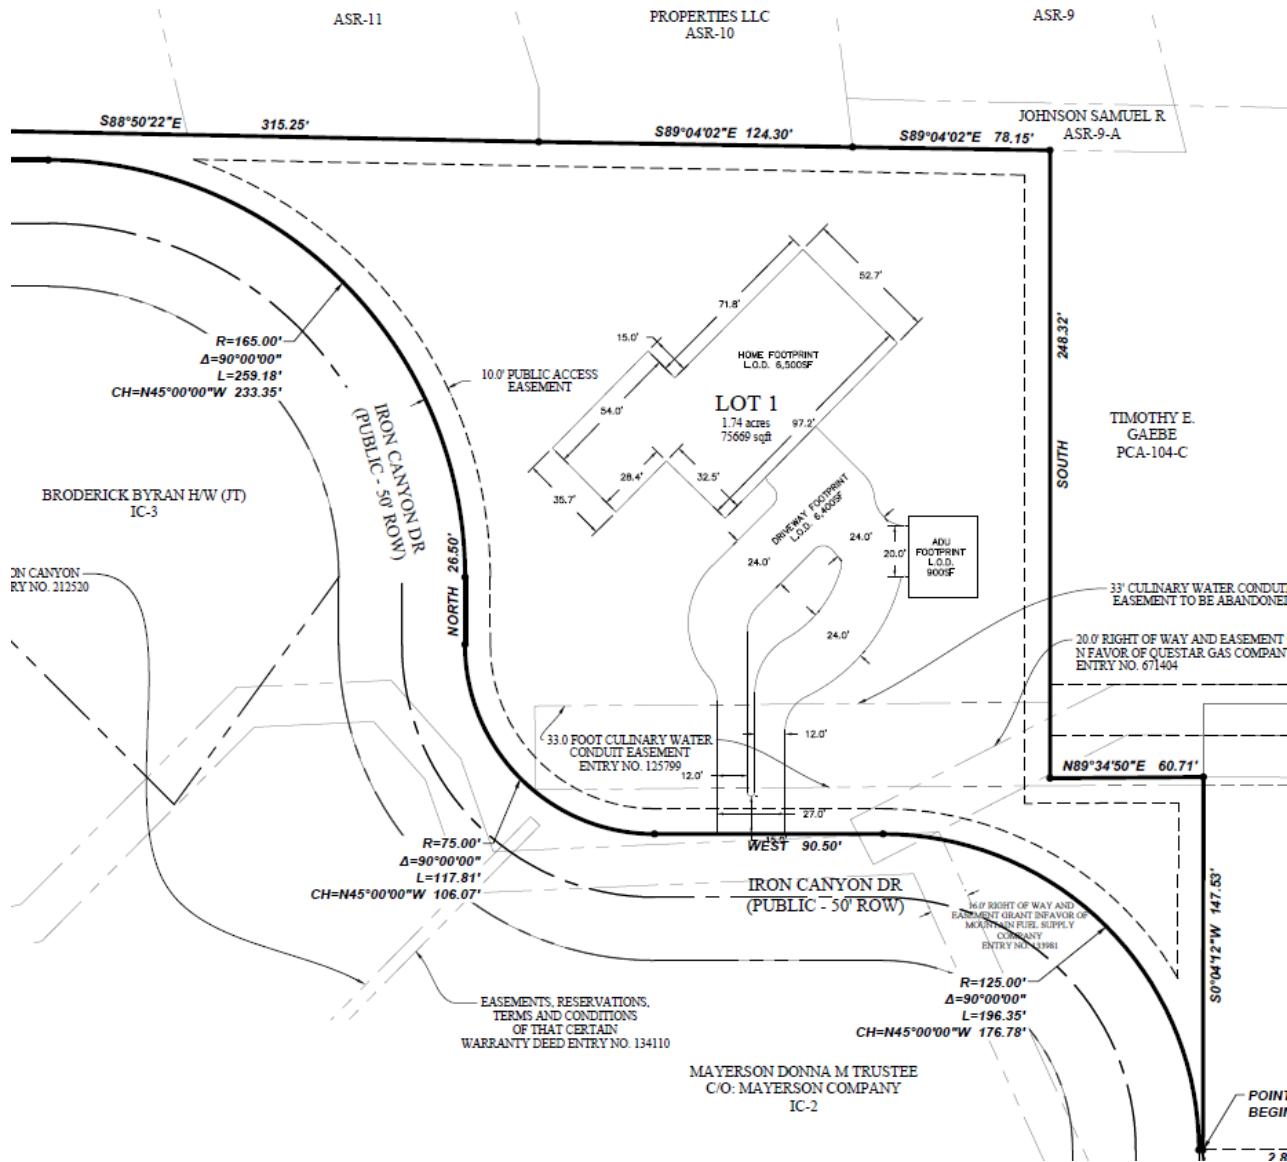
Updated Final Plat with reduced hard surface paved area (driveway) and platted LOD boundary.
